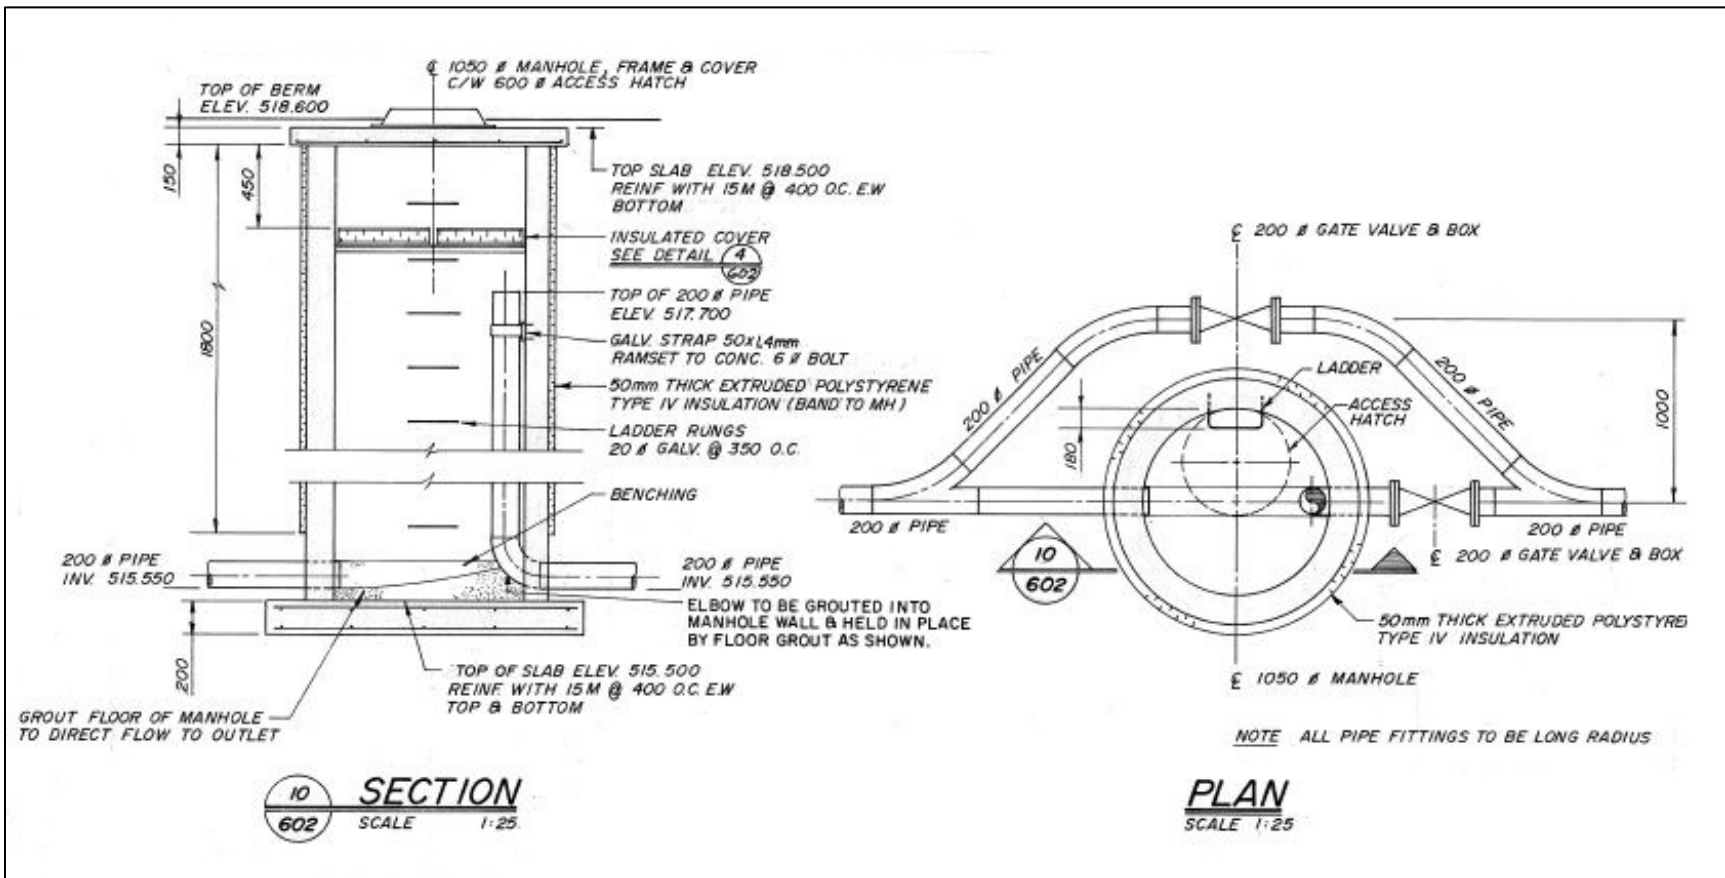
1988 Construction drawing - Overflow manhole details (Modified from Bullée Consulting Ltd. 1988c)
